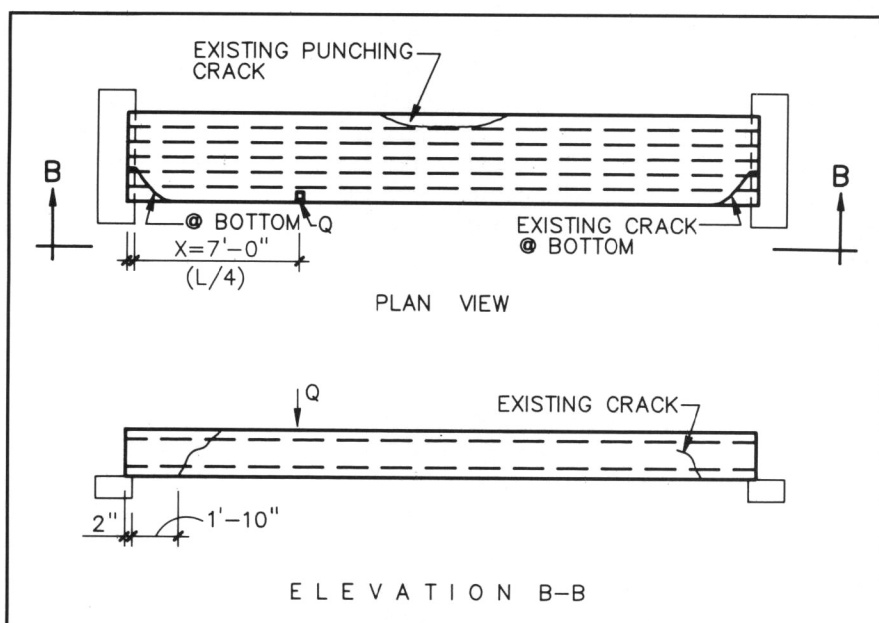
Plan view and side elevation sketches showing existing crack position.
